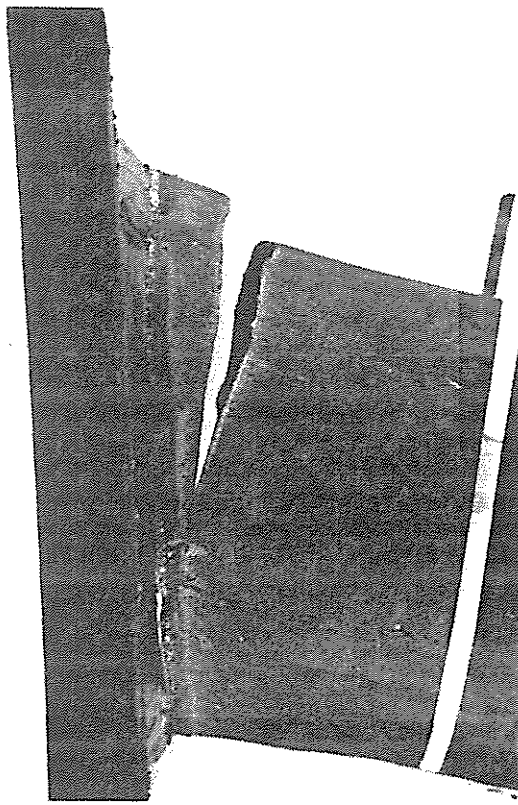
Fracture at End of Horizontally Fixed Specimen IAIII
